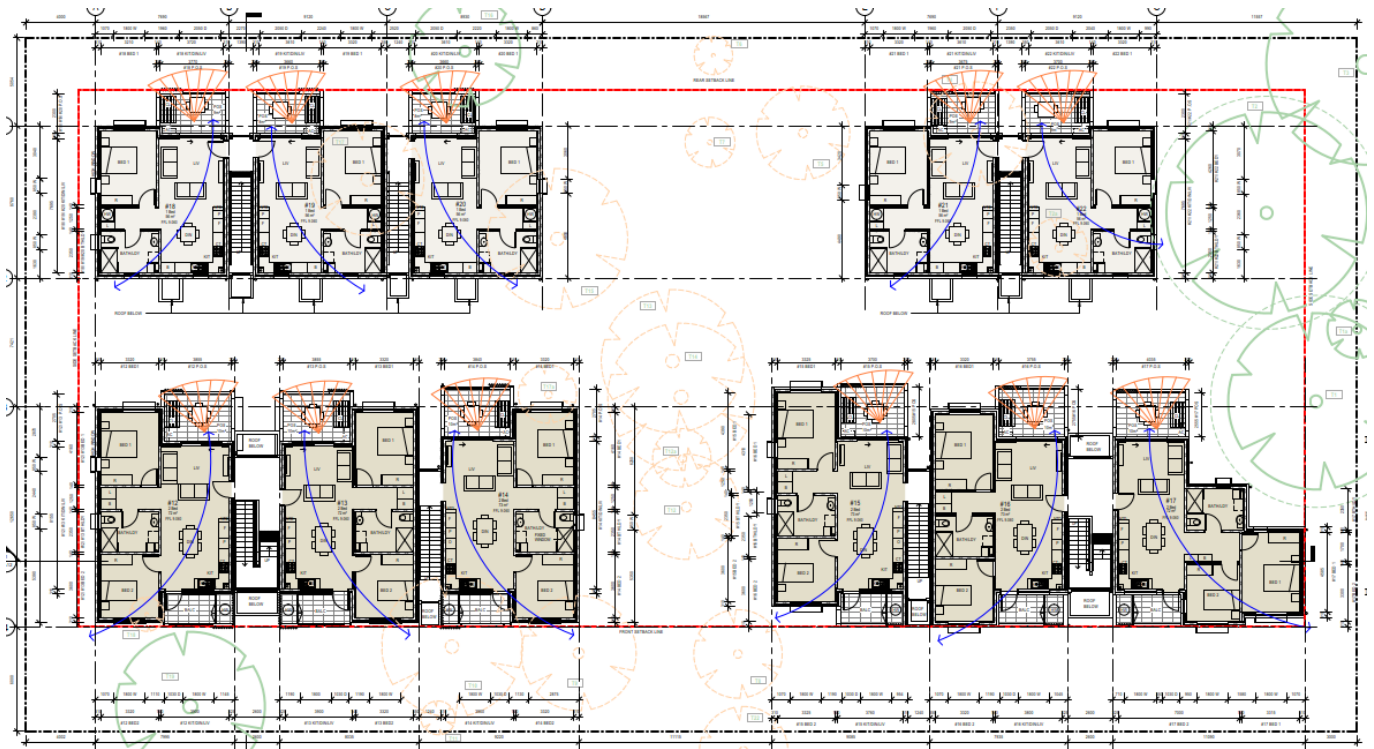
Extract from Architectural Plans – First Floor (Source: Architectural Plans, Brewster Murray, dated 23/07/2024)
